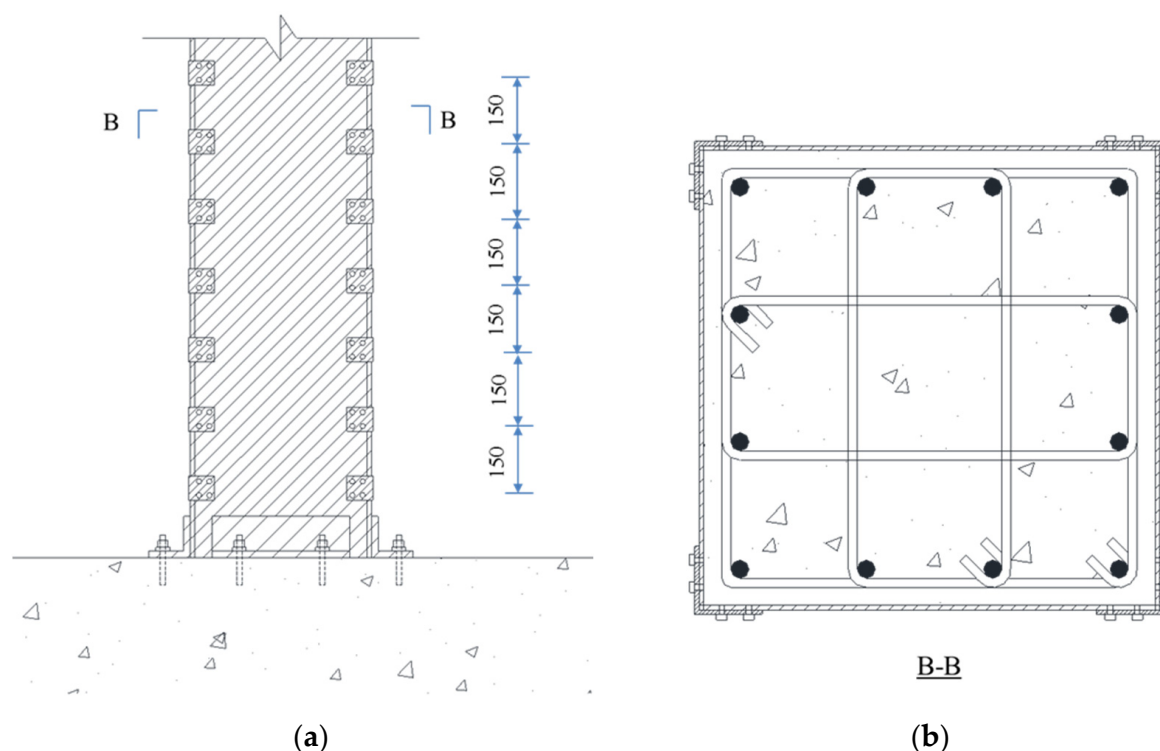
Strengthened RC column: (a) front view; (b) plane view.
